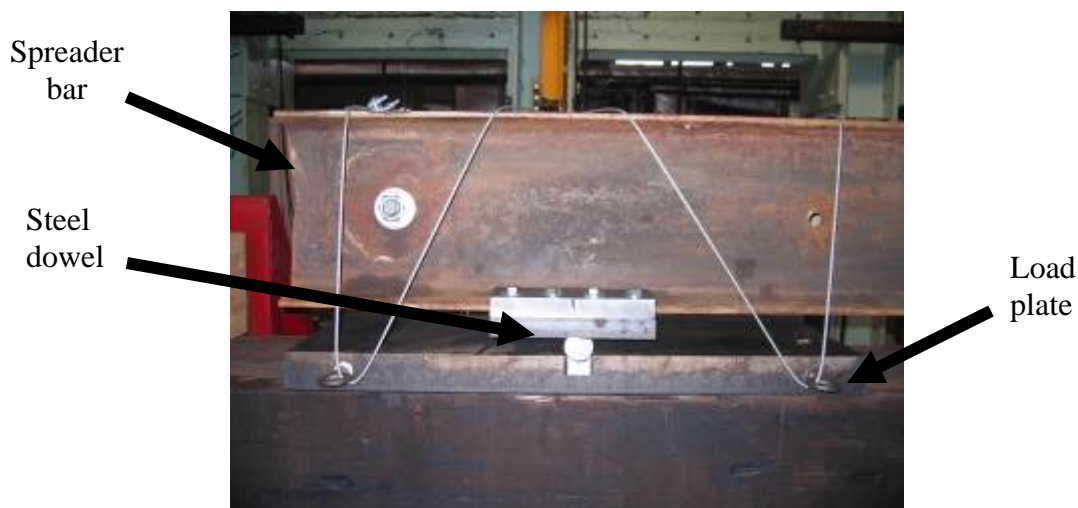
Detail of left loading plate. The I beam is the spreader bar, and the load is channeled through this spreader to a steel dowel point load to a steel plate resting on top of the specimen. The cables which are visible around the spreader bar and plate are for safety reasons.
